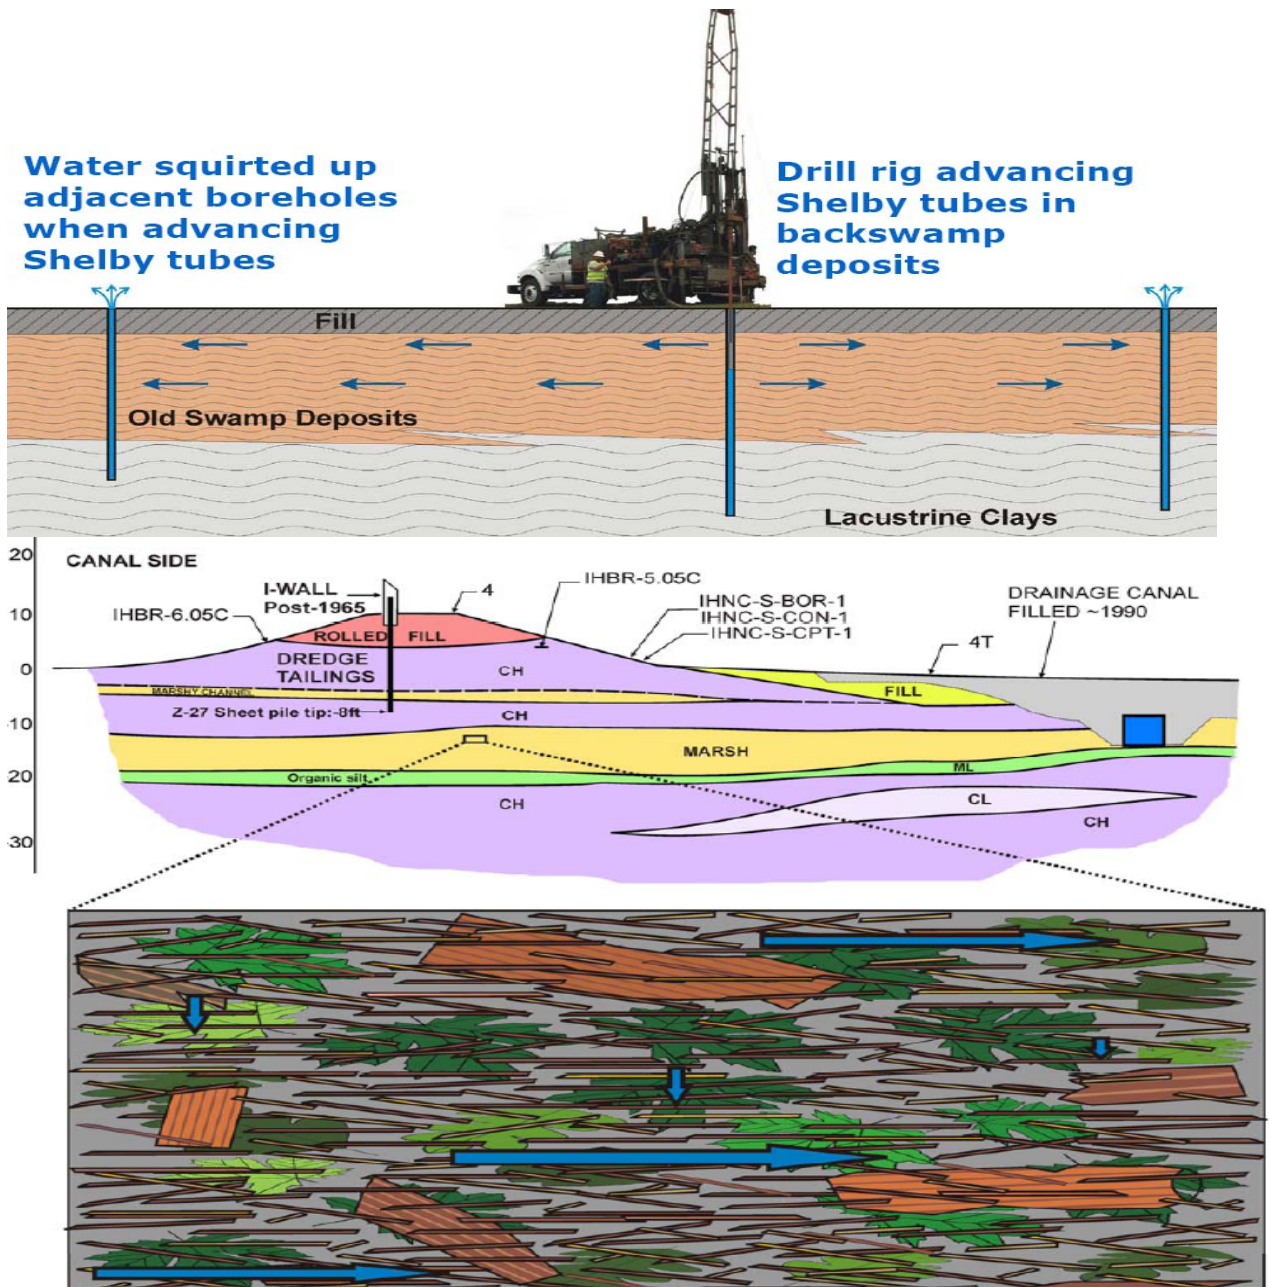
Observations made during soil borings performed at Lower 9th Ward breach locations that penetrated the buried marsh layers (Bea 2008 from Rogers 2007).
